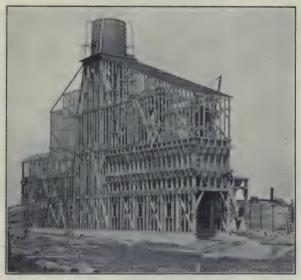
Photograph Showing Studdings for Side Walls of Washery
